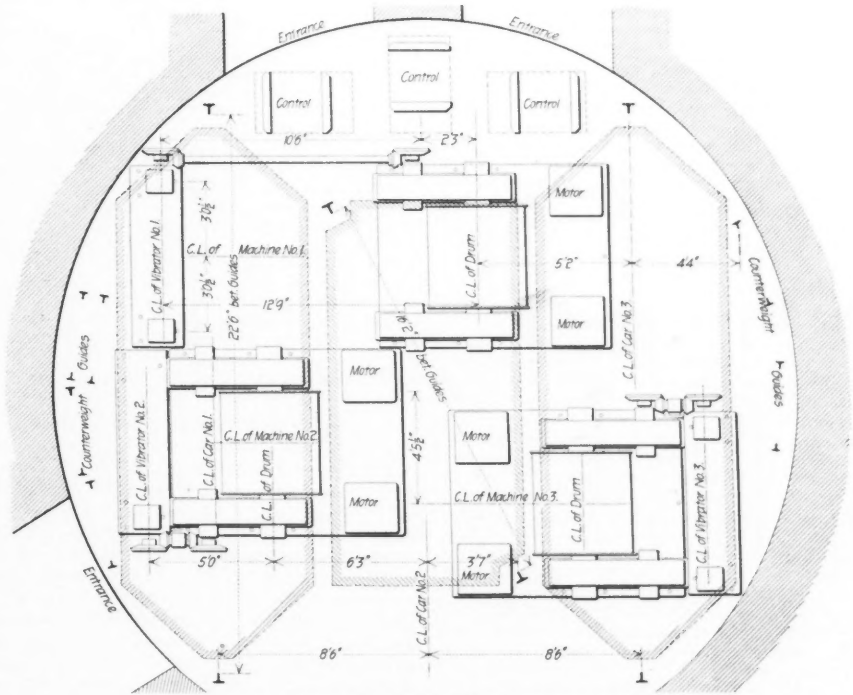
PLAN OF BOTTOM OF 30-FT. SHAFT.
